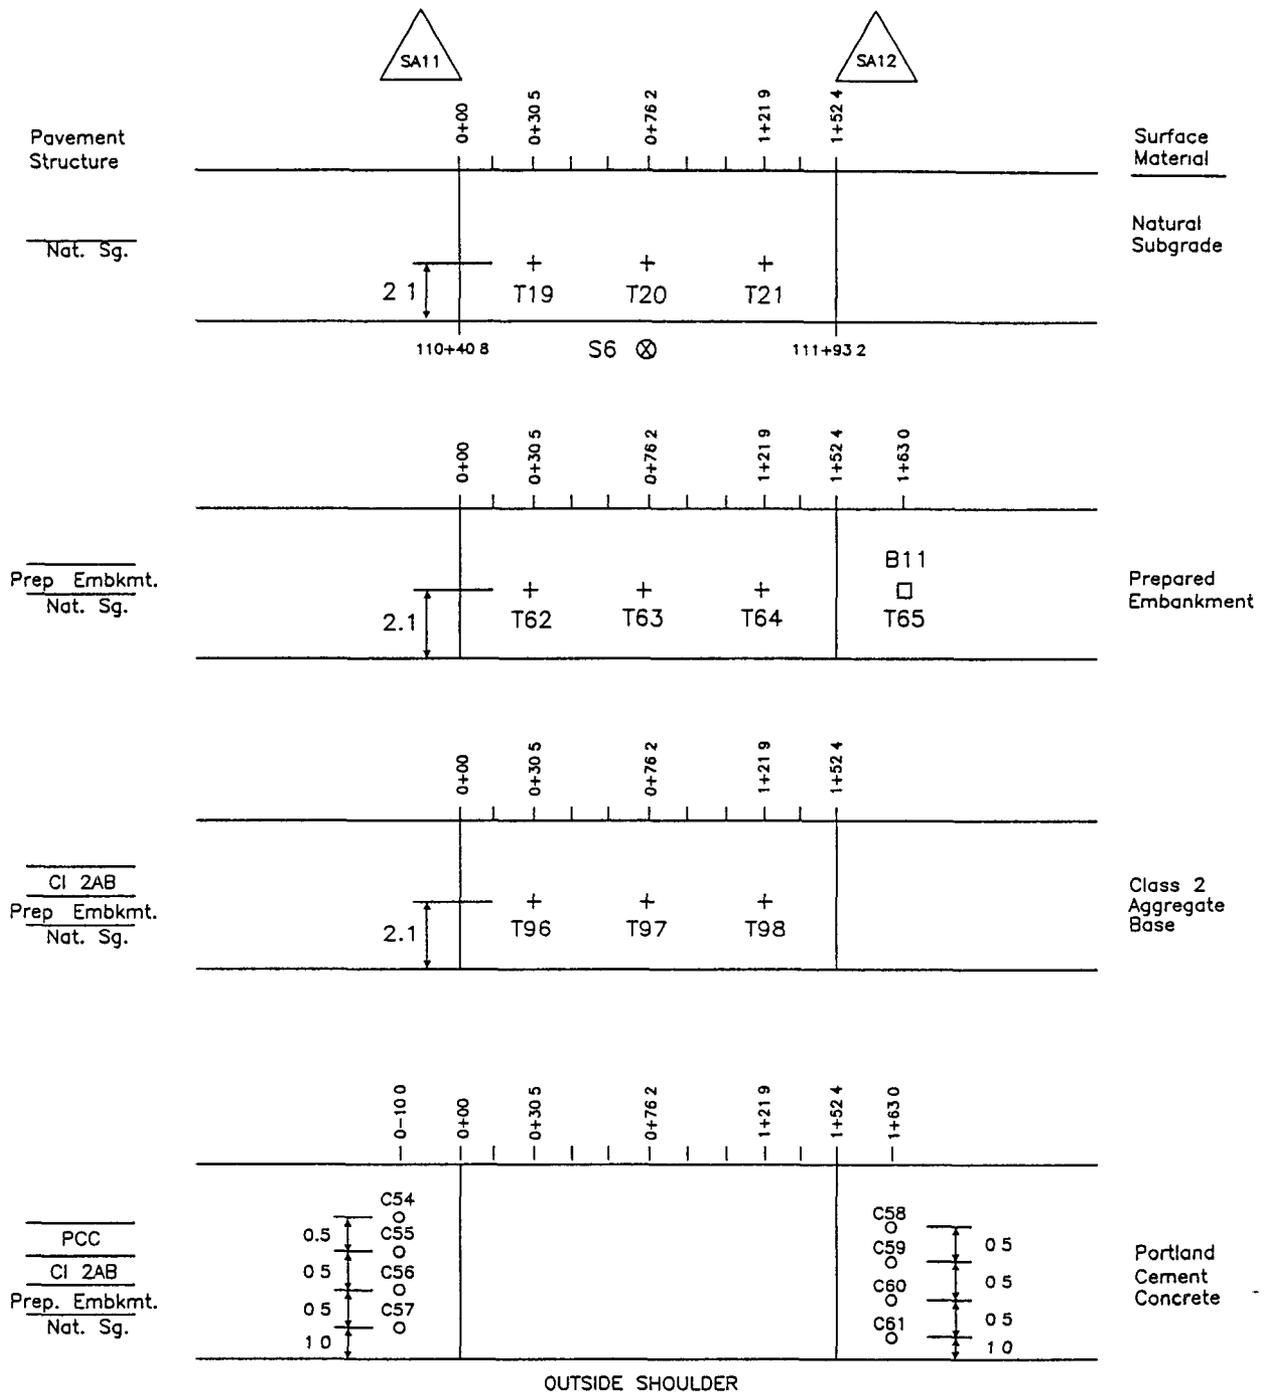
Sampling and test plan for test section 060206, SPS-2 California.
